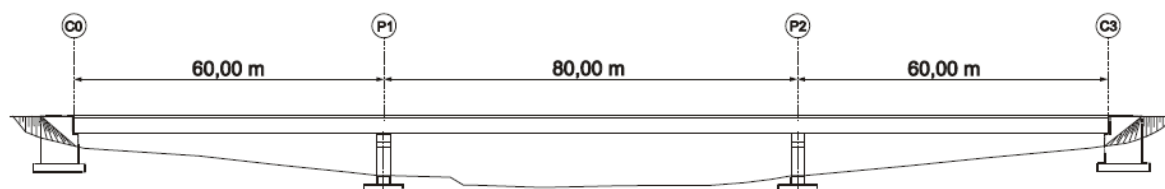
Example of a steel-concrete composite two-girder bridge (Davaine, 2010a)
